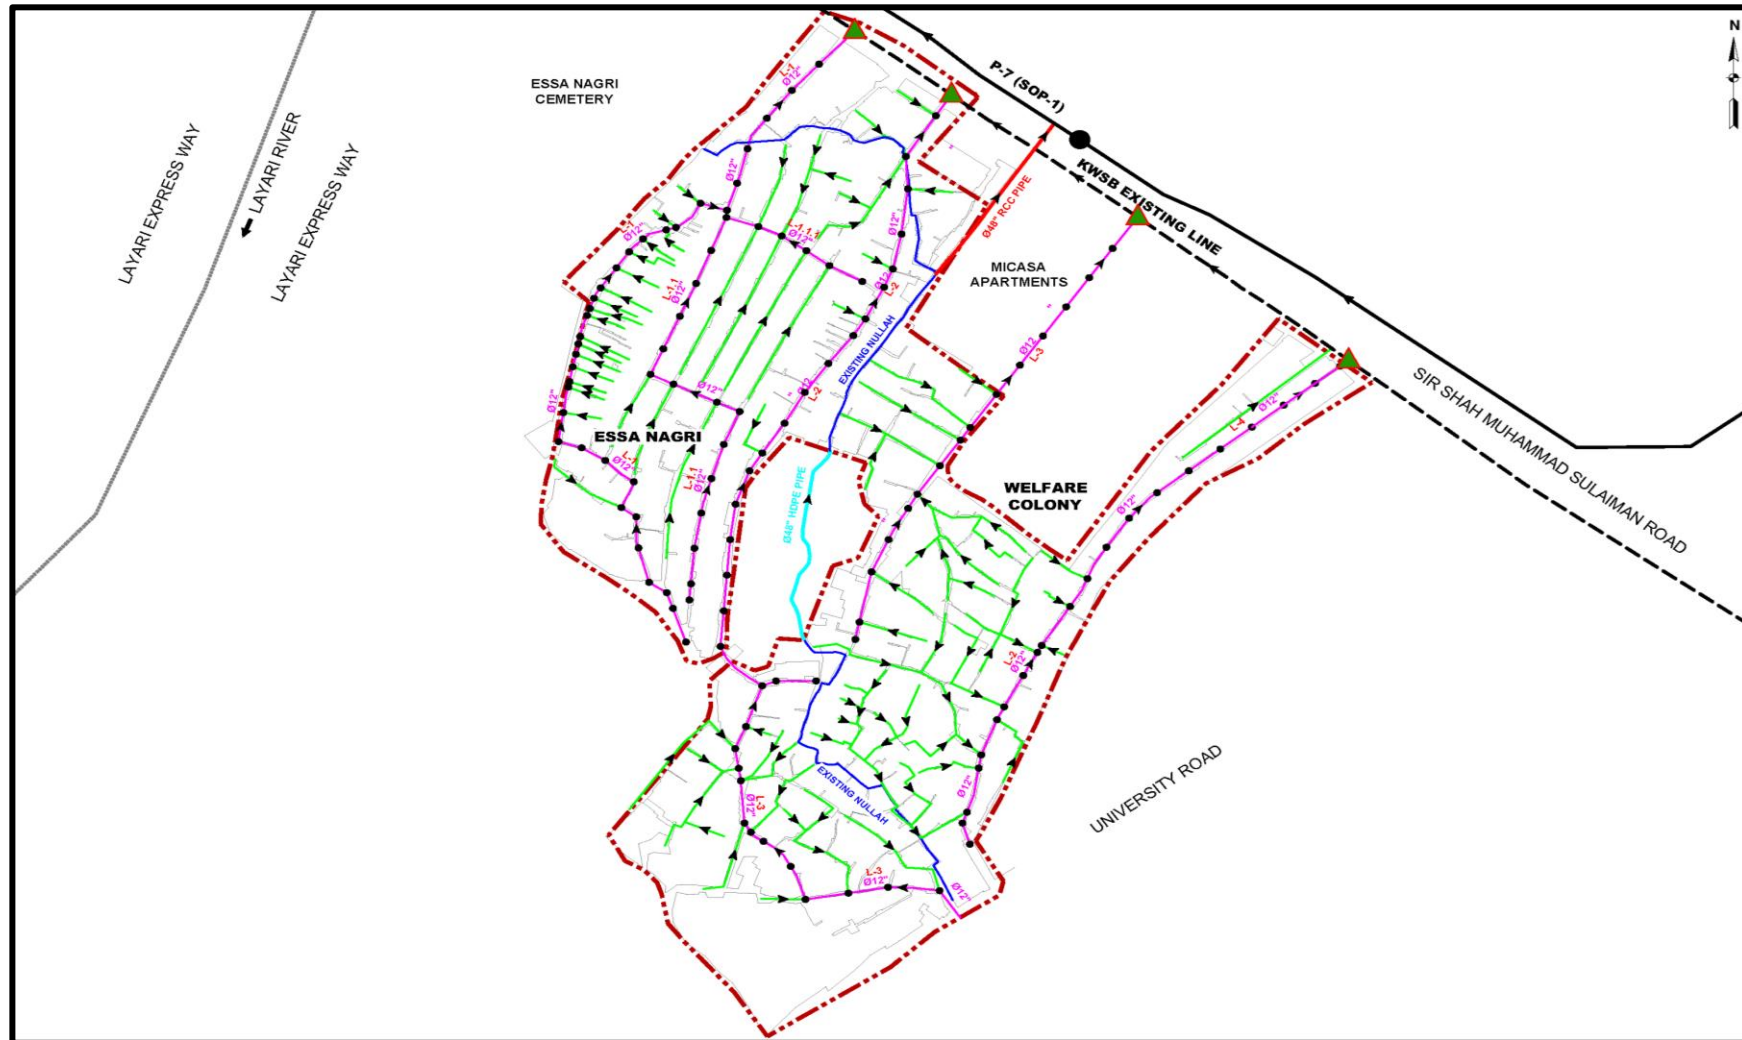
Layout Plan of Proposed Sewerage System in Essa Nagri and Welfare Colony
